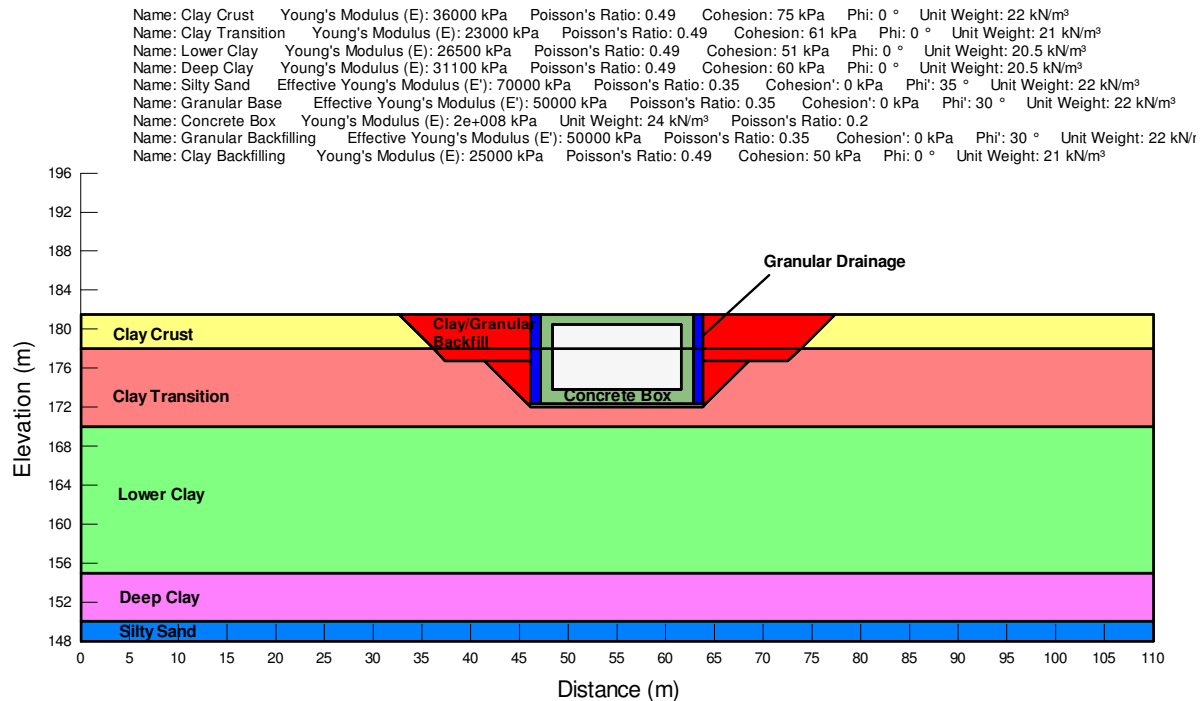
Stress-Deformation Model for Concrete Box Structure B-8.
